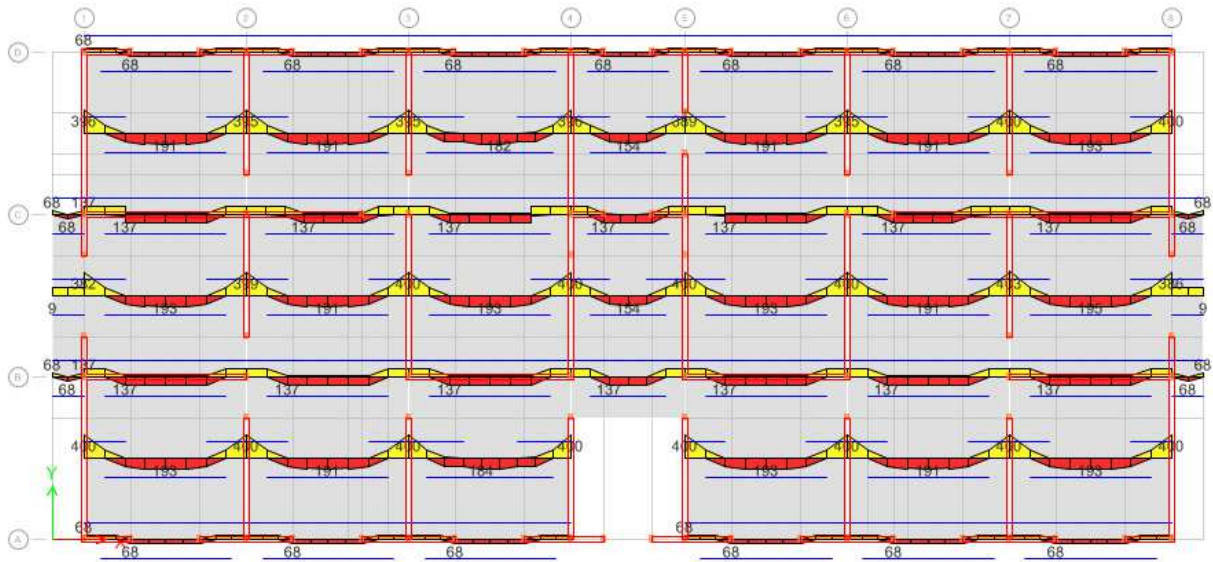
Plan of the slab. 1st floor. Layer A. Top and bottom reinforcement
